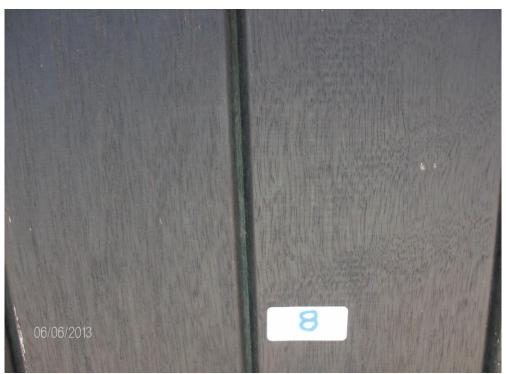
In cladding no. 08 (XXX Frake Black), no obvious defects appearing in the surface. This cladding surface looks shiny and in an excellent condition.
